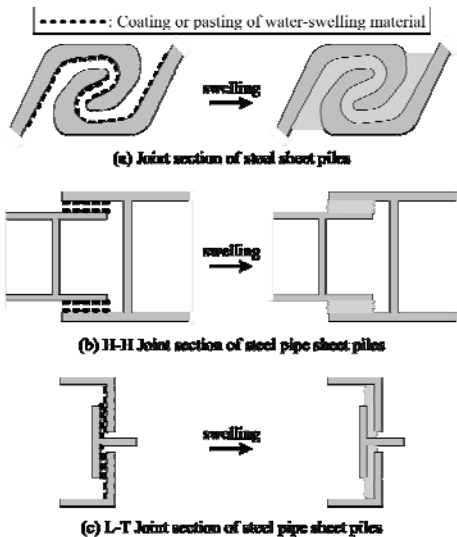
Water cut-off treatment on joint section of steel sheet piles or steel pipe sheet using water swelling materials
